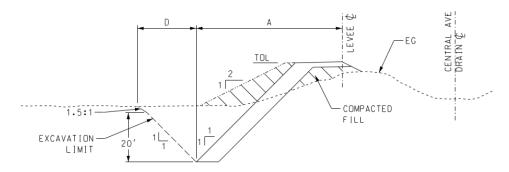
Typical Mitigation Section (Sta. 501+00, Central Avenue Drain, to Sta. 528+00)
